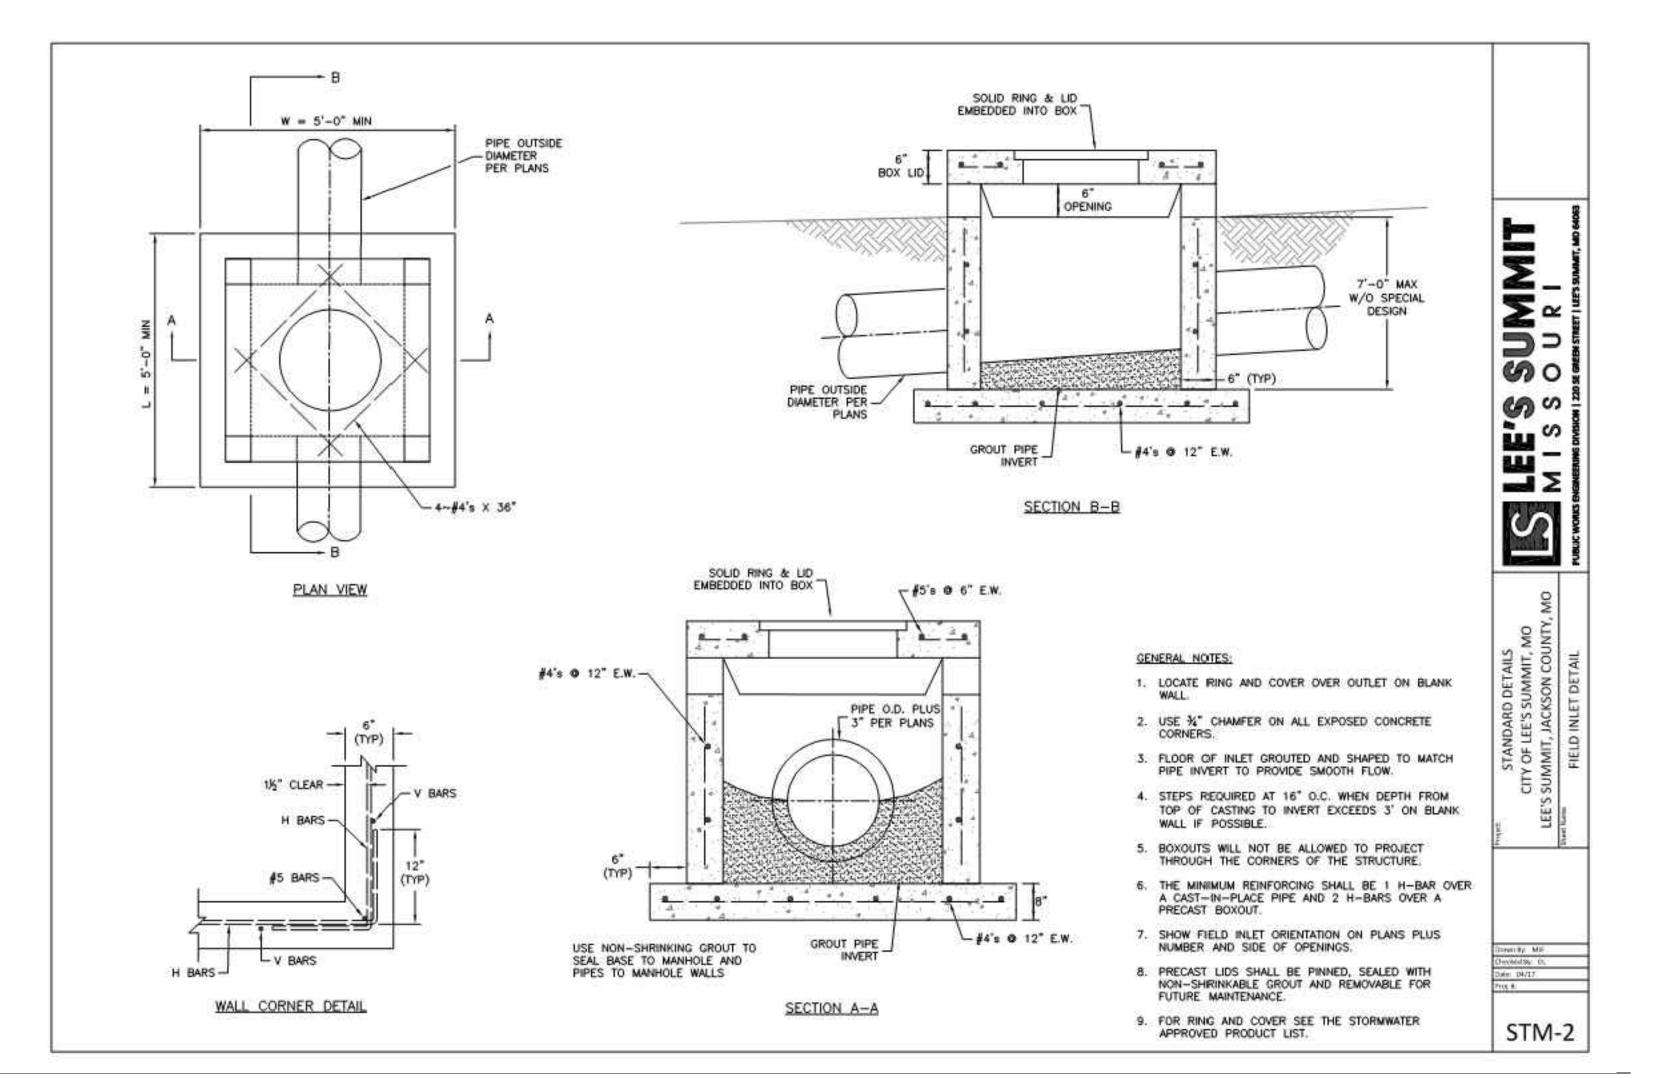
DETAIL SHEET PUBLIC STREET IMPROVEMENT PLAN	NW LEE'S SUMMIT ROAD & NE DOUGLAS STREET	LEE'S SUMMIT, MO
